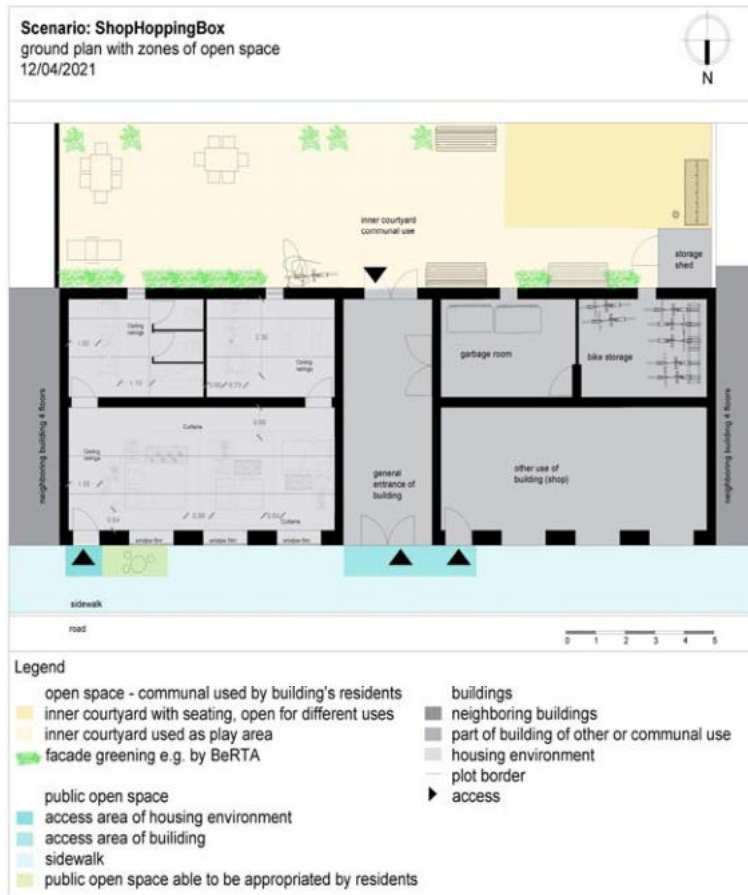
ShopHoppinBox – Site zoning plan<sup>61</sup>
